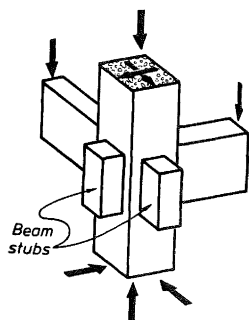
BEAM STUBS AT EXTERIOR JOINTS TO ACCOMMODATE BEAM BAR ANCHORAGES [25]
